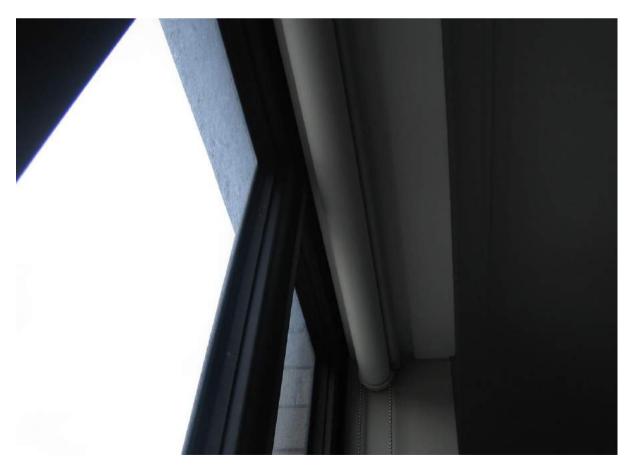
Water penetration emanating from head of window in bedroom 2 in Unit 301.
